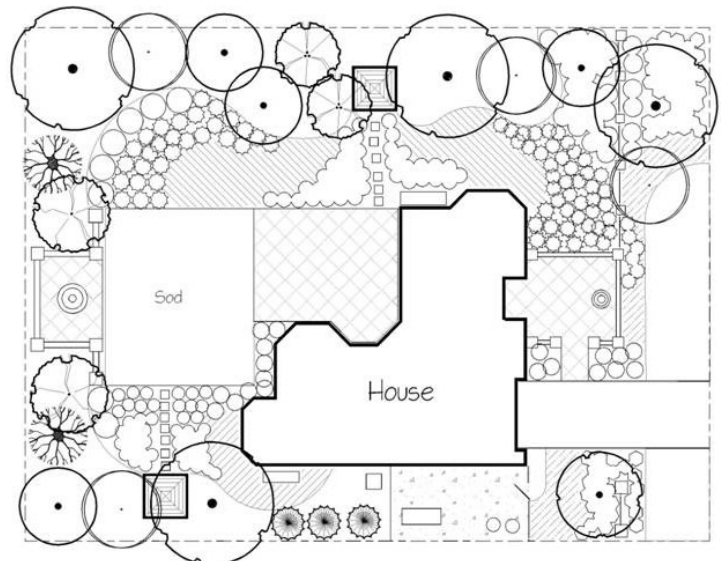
A sample Florida-Friendly Landscape Master Plan
